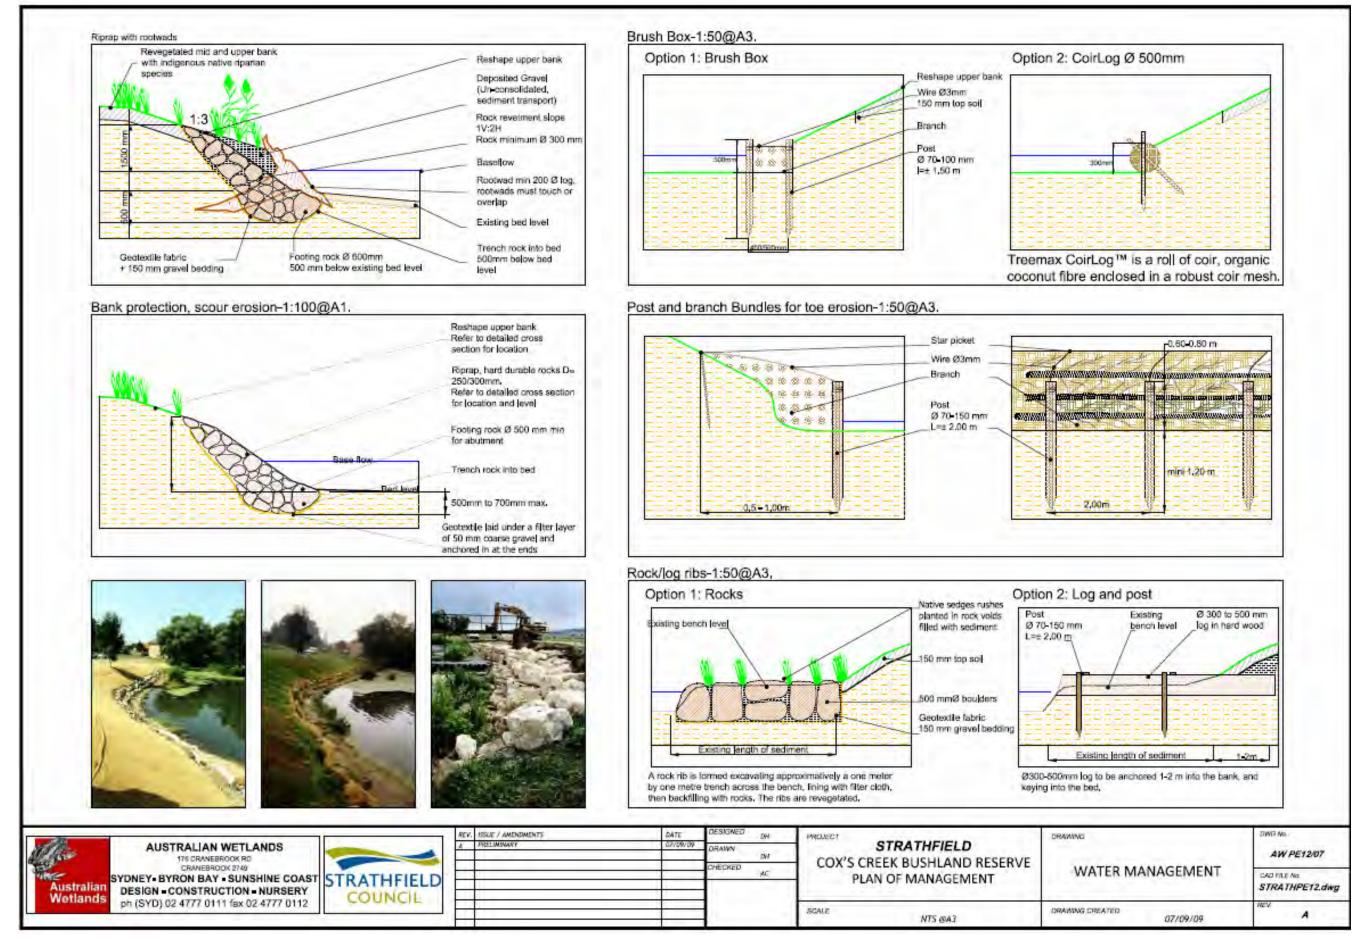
Water Management - Plan 2 (Drawing No. AW PE 12/07)
